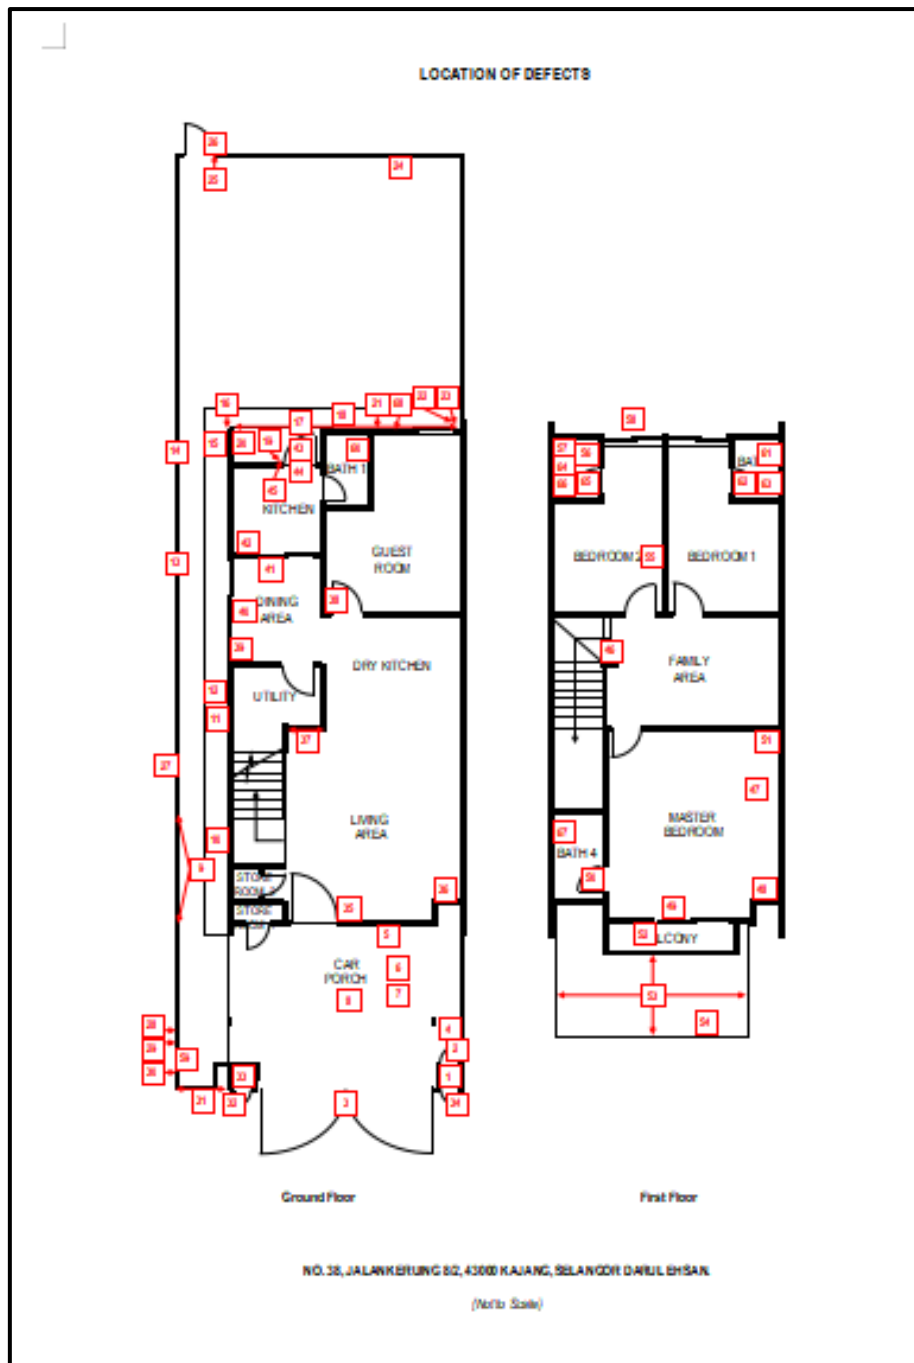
Floor Plan for House No. 38 with Tagging
